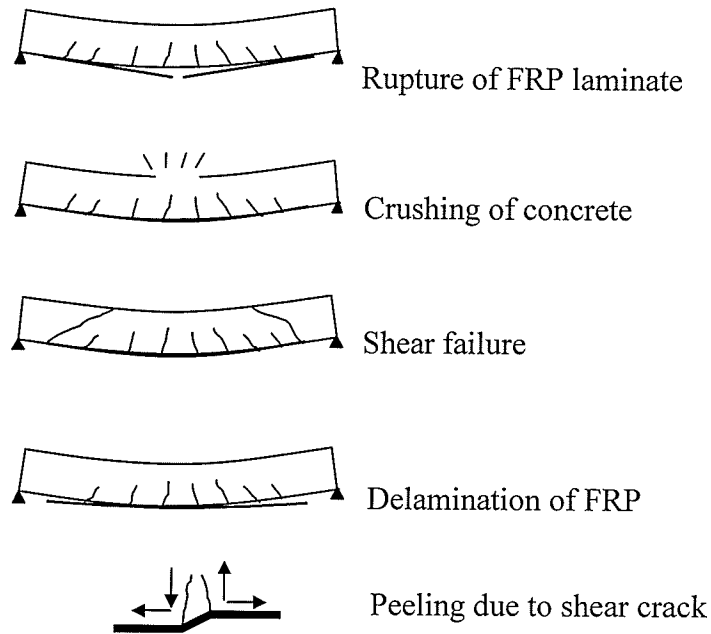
Failure modes in FRP retrofitted concrete beams
